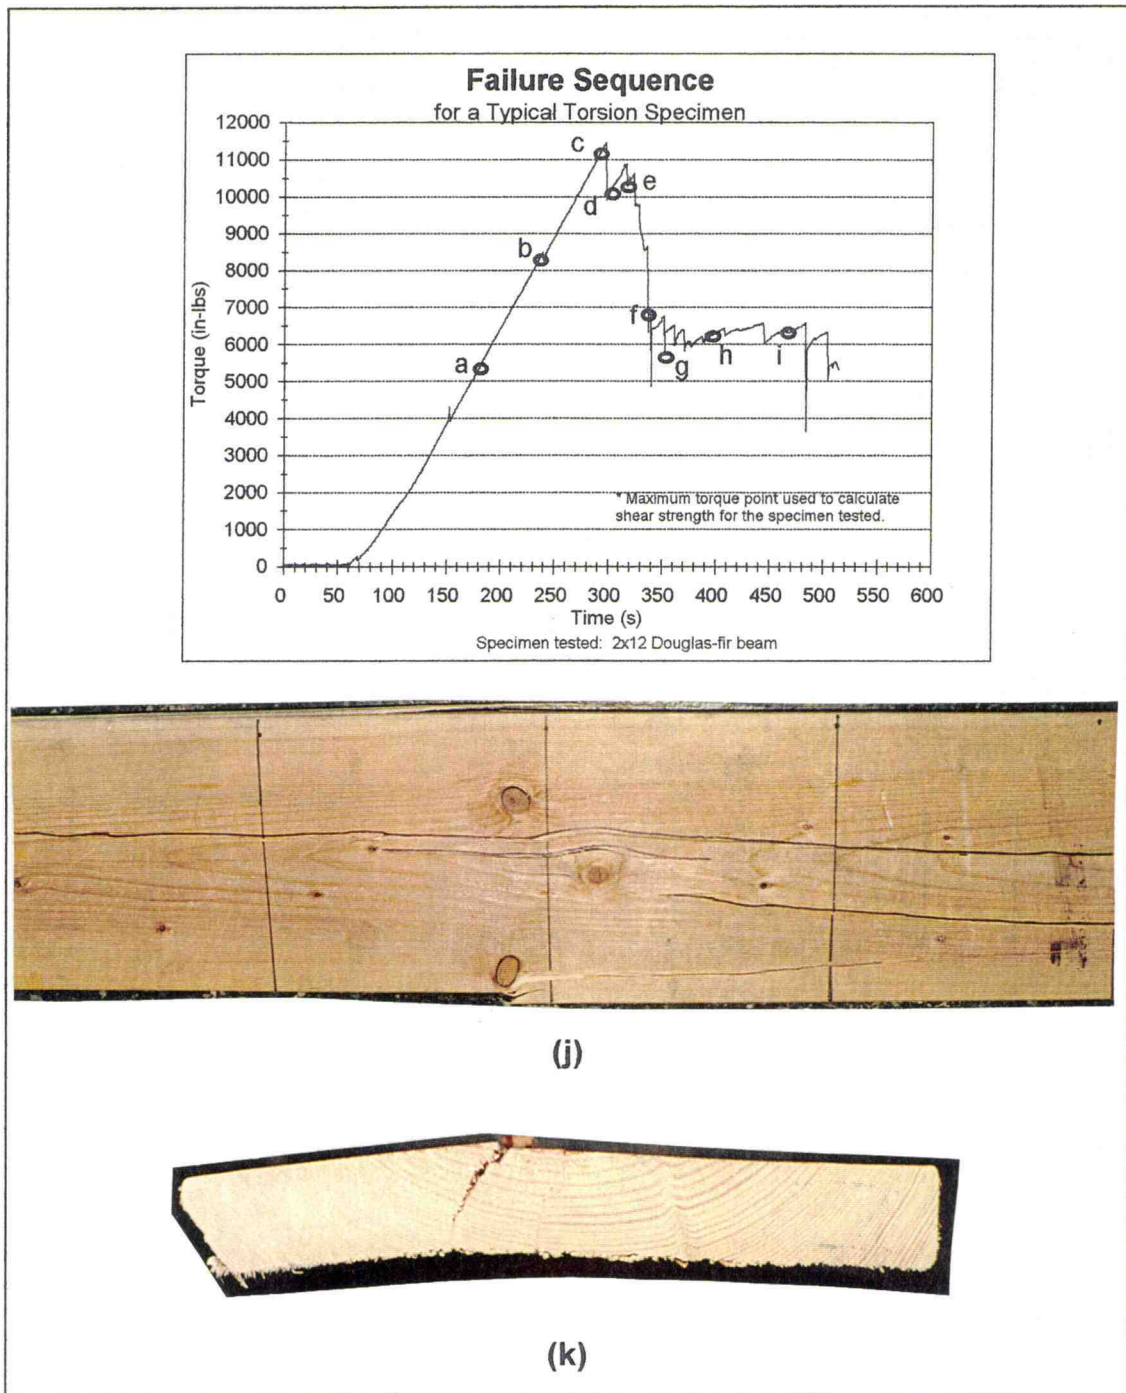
Typical shear failure observed in structural lumber tested in torsion. After specimen is removed from the torsion machine the shear failure is noticeable. (j) Longitudinal shear failure (k) cross sectional shear failure
